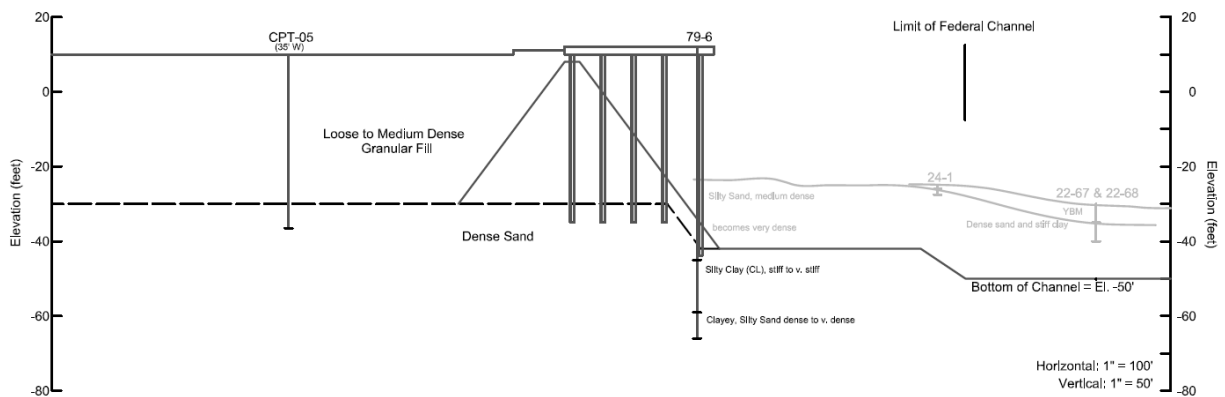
Howard Terminal Cross-Section B-B' (Existing)
